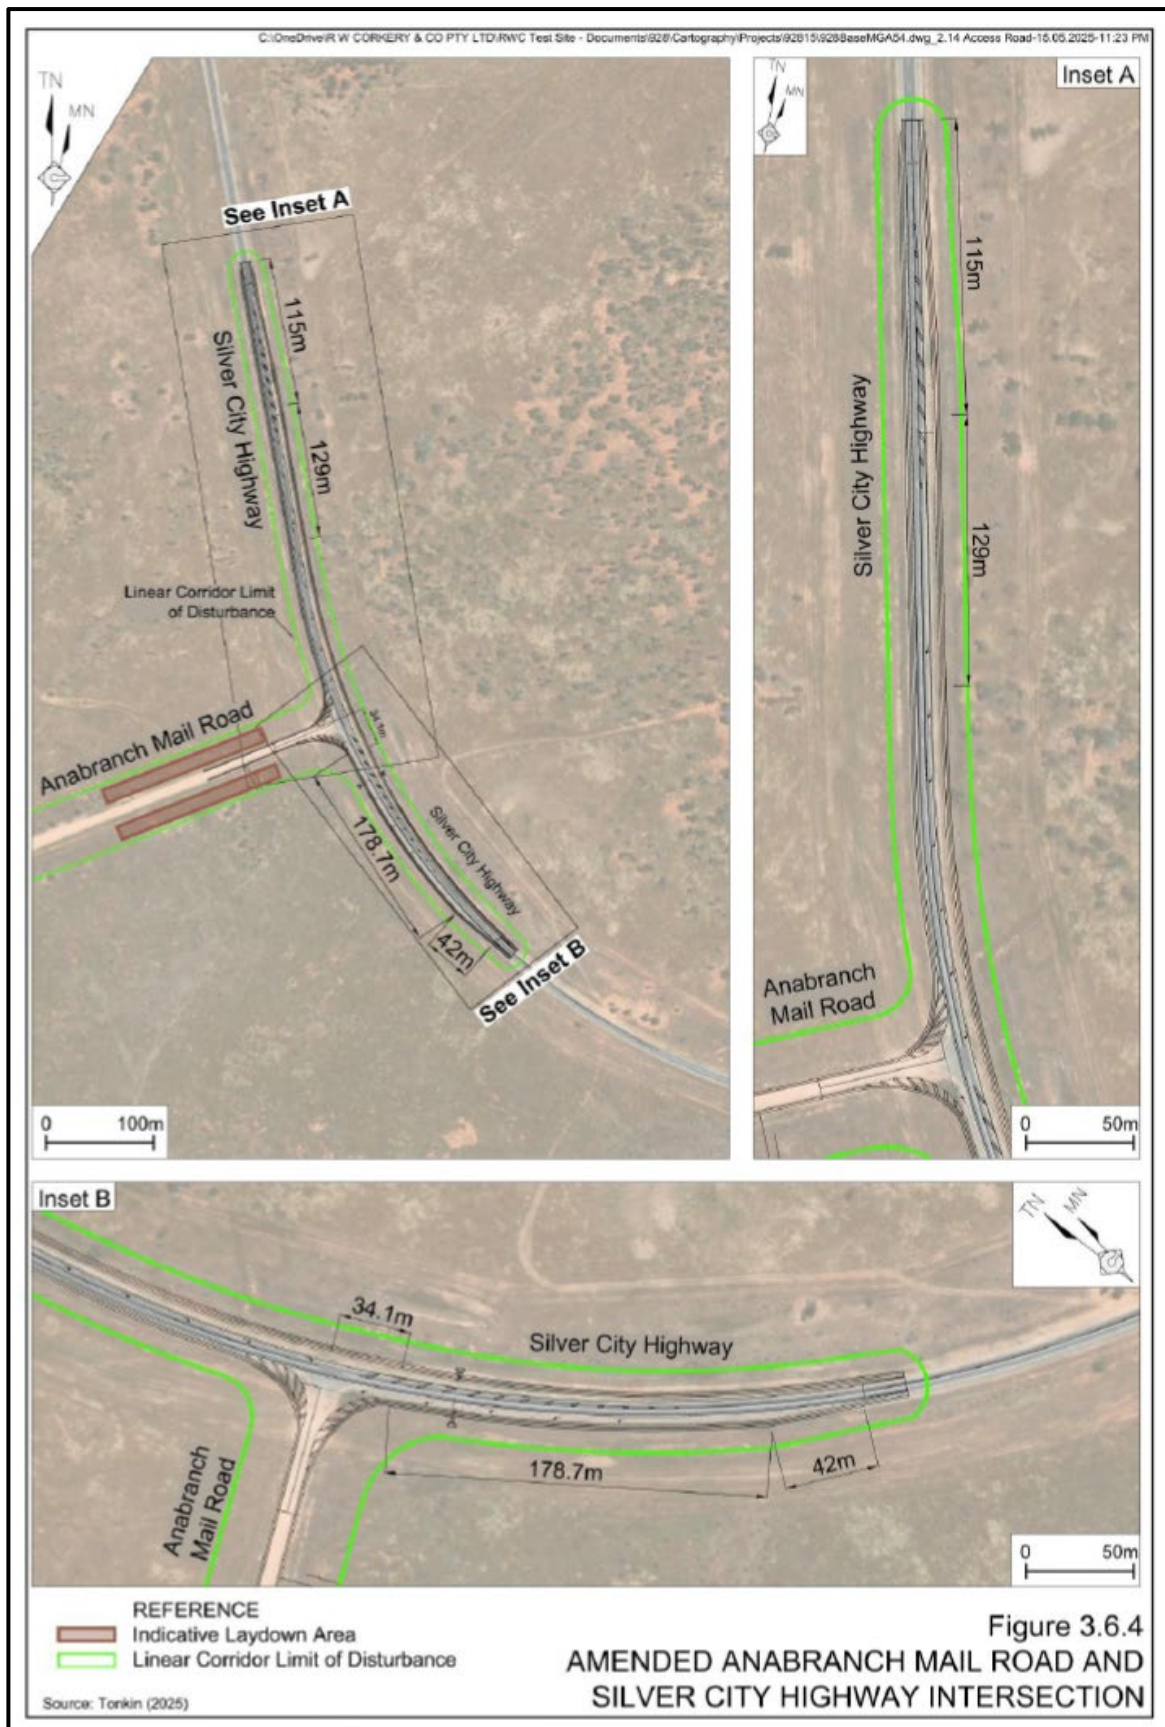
Anabbranch Mail Road and Silver City Highway intersection upgrade (Source: Amendment report, Appendix 1, August 2025)
